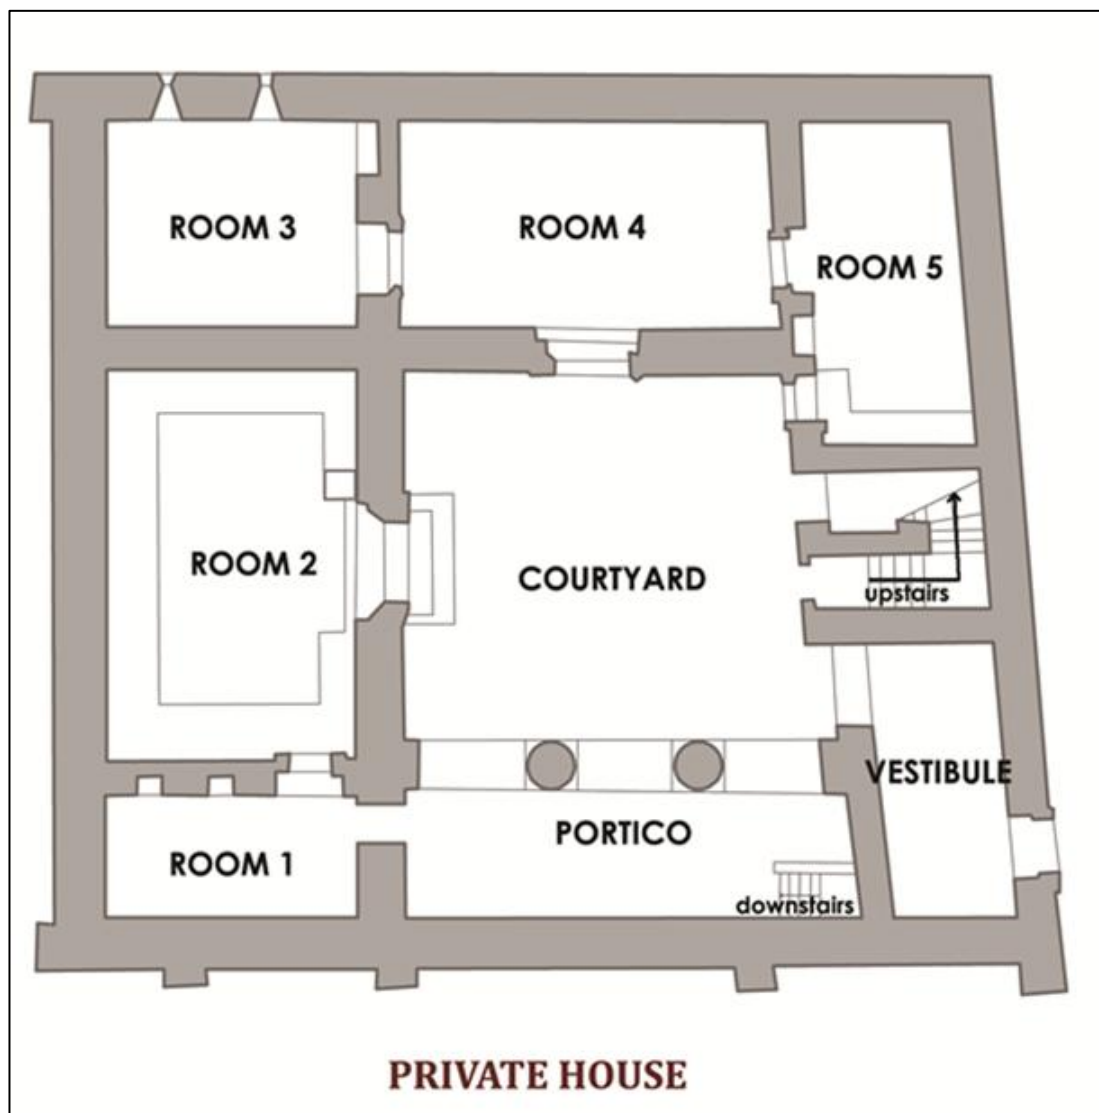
Plan of the private house in Dura Europos (after Kraeling, 1967, p. 35)
